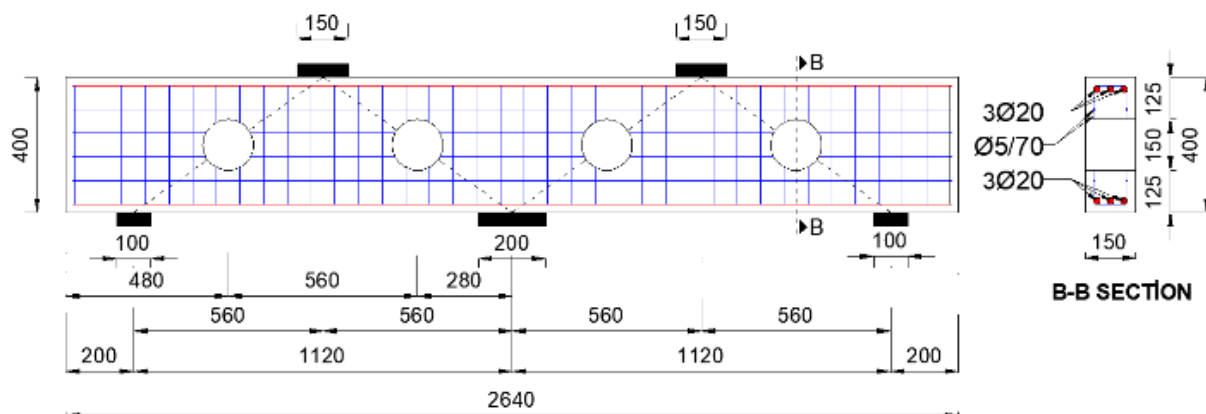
Control deep beam (RCDB-R) size and cross-sectional properties with reinforcement arrangement (Unit: mm)
